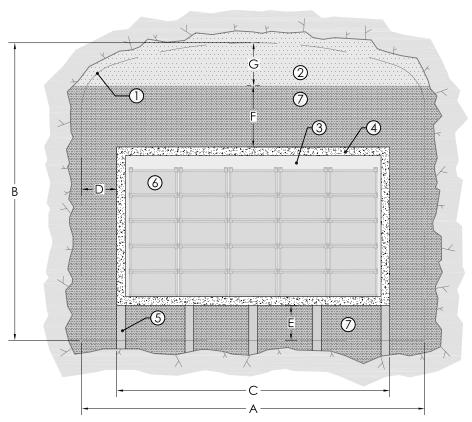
Schematic cross-sectional layout of the repository section for the waste from AB SVAFO and Studsvik Nuclear AB. Legend: 1) Theoretical tunnel contour. 2) Bentonite pellets. 3) Grout. 4) Concrete structure for the operating phase (0.5 m). 5) Granite pillars. 6) Waste container. 7) Bentonite blocks. Approximate dimensions: A = 20 m, B = 17 m, C = 16 m, D = 2 m, E = 2 m, F = 3-4 m, G = 2-3 m.
